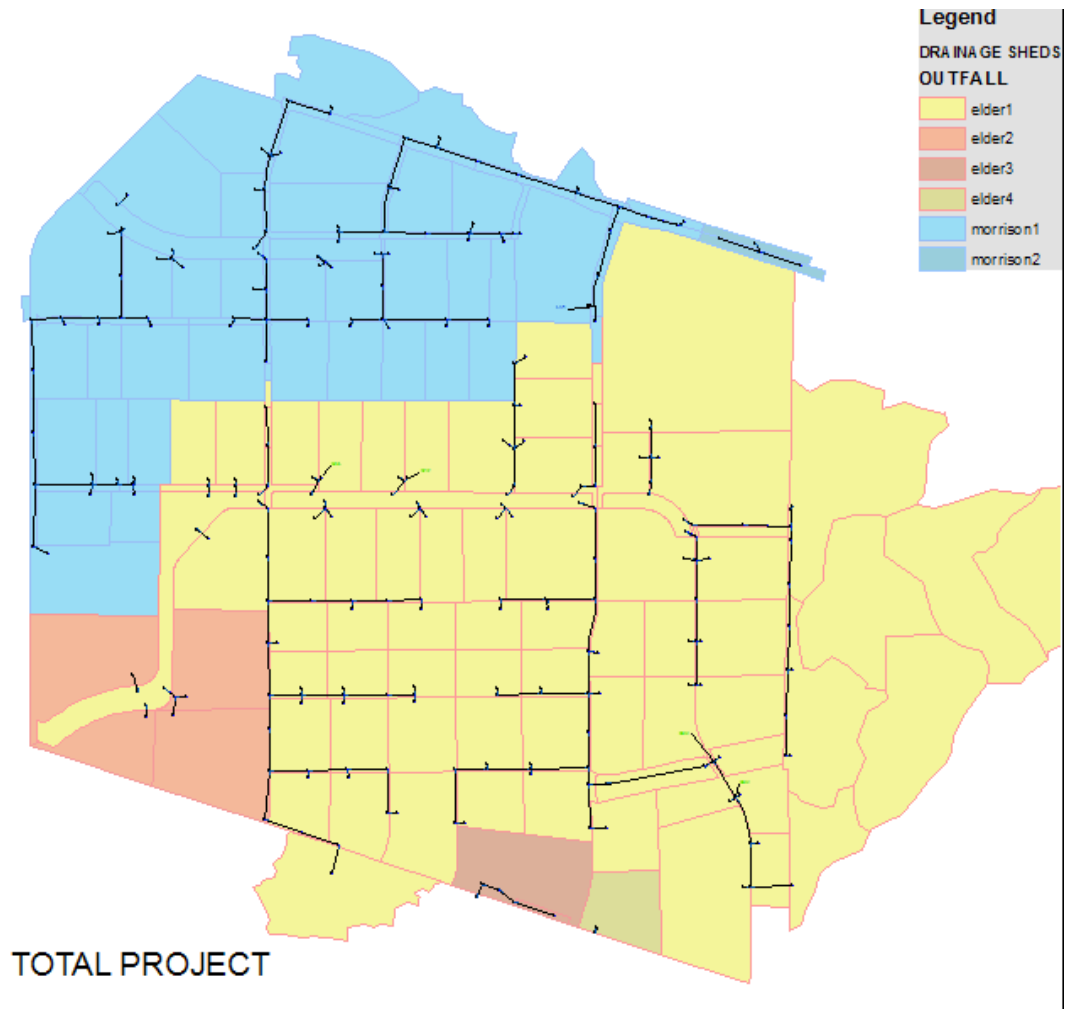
Storm Drain Layout and Watersheds by Outfall Location:
